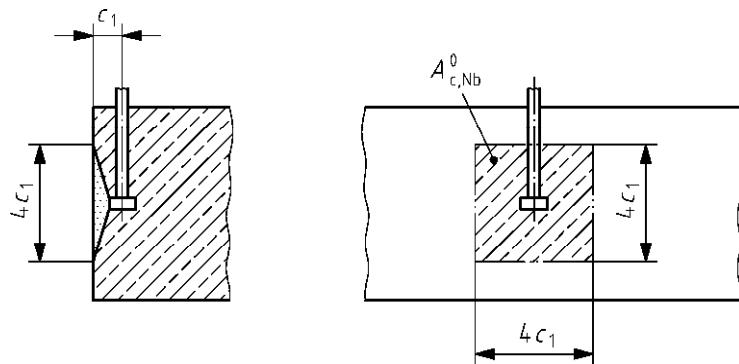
Idealized concrete break-out body and area $A_{c,Nb}^0$ of an individual fastener in case of blow-out failure
